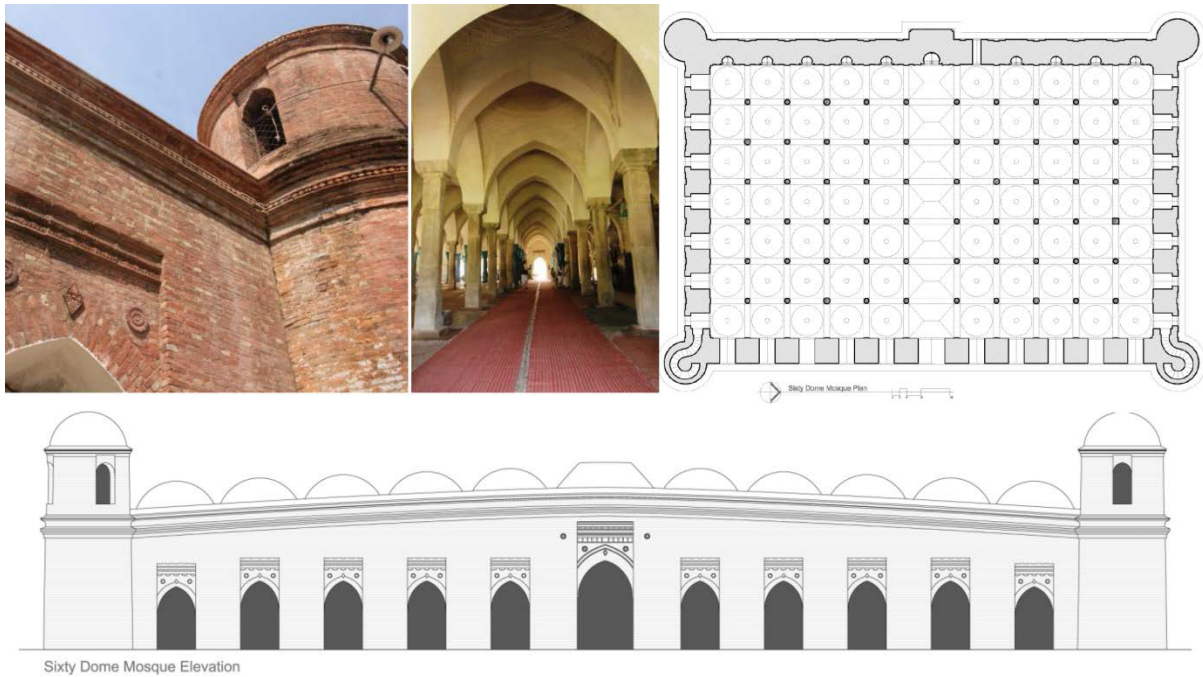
Pictures, Plan and Elevation of Sixty Dome mosque
